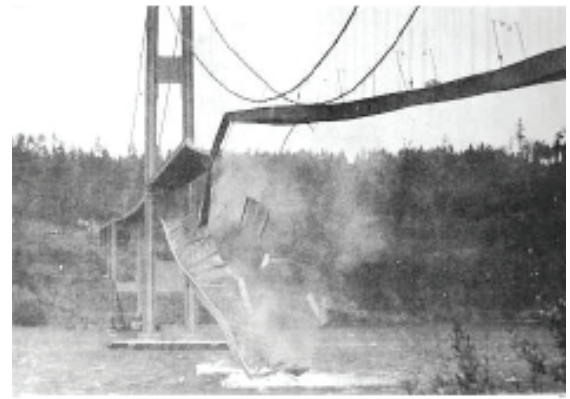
Structural Failure of the Roadbed of the Tacoma Narrows Bridge [15]
